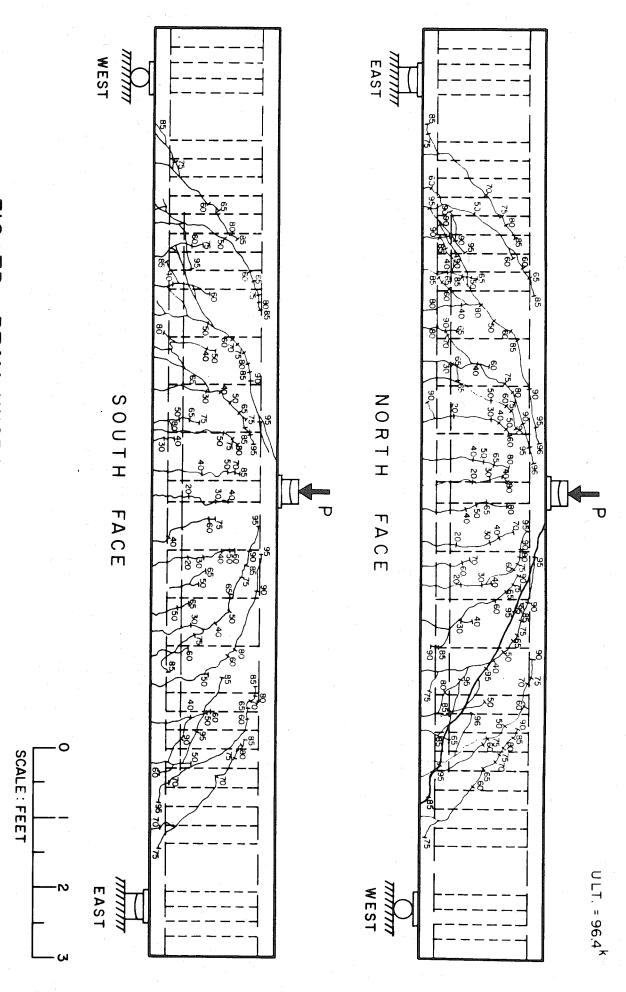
D BEAM IWCRA-I CRACK PATTERN
